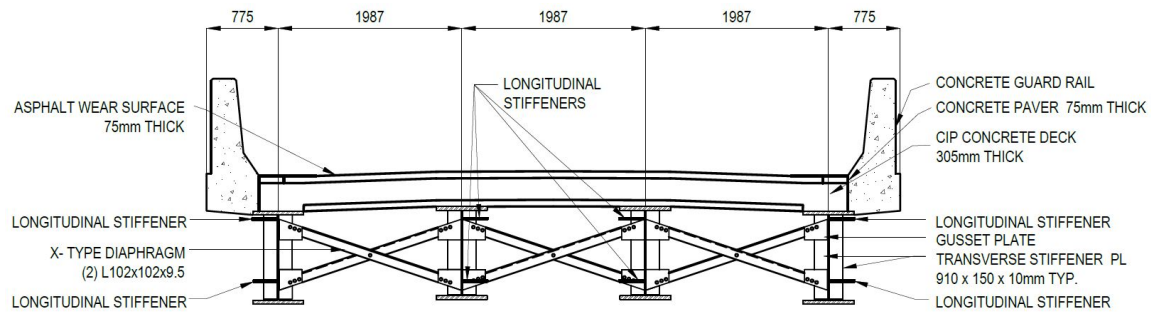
Mountbatten Bridge Cross Section (all dimensions mm).
